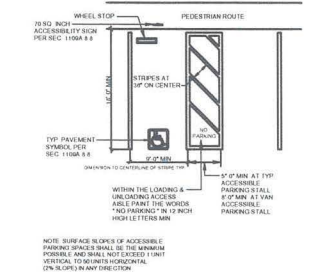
A-2B SINGLE AND VAN ACCESSIBLE PARKING STALLS
